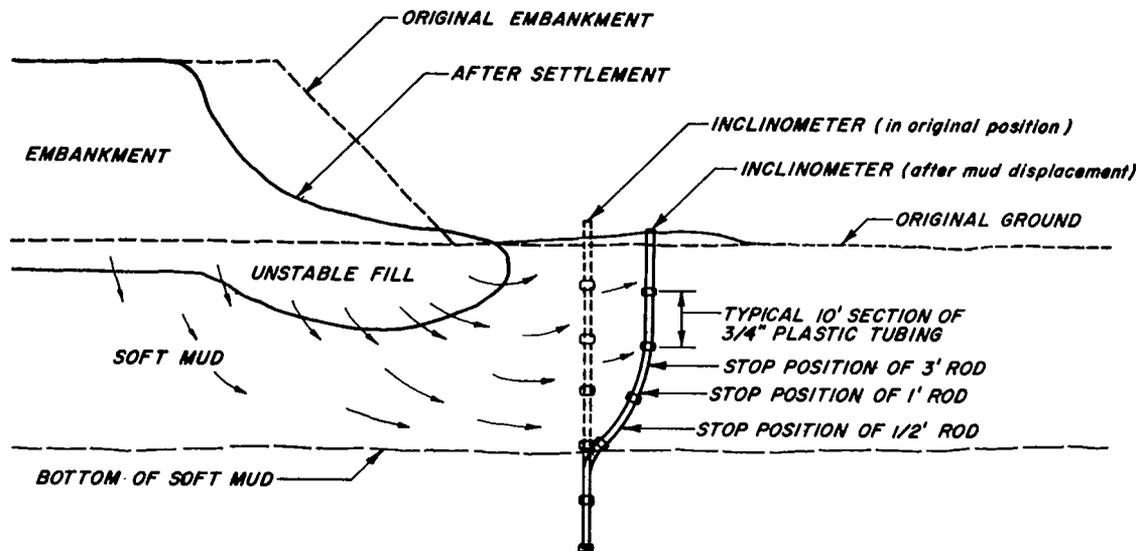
An inclinometer installation placed to observe tilt associated with lateral deformation of the foundation soils underlying a roadway embankment. Inclinometer sensitivities are such that even minute movements can be closely associated with elevation and used to define the geometry and rate of deformation (From California Dept. of Transportation, 1973).
